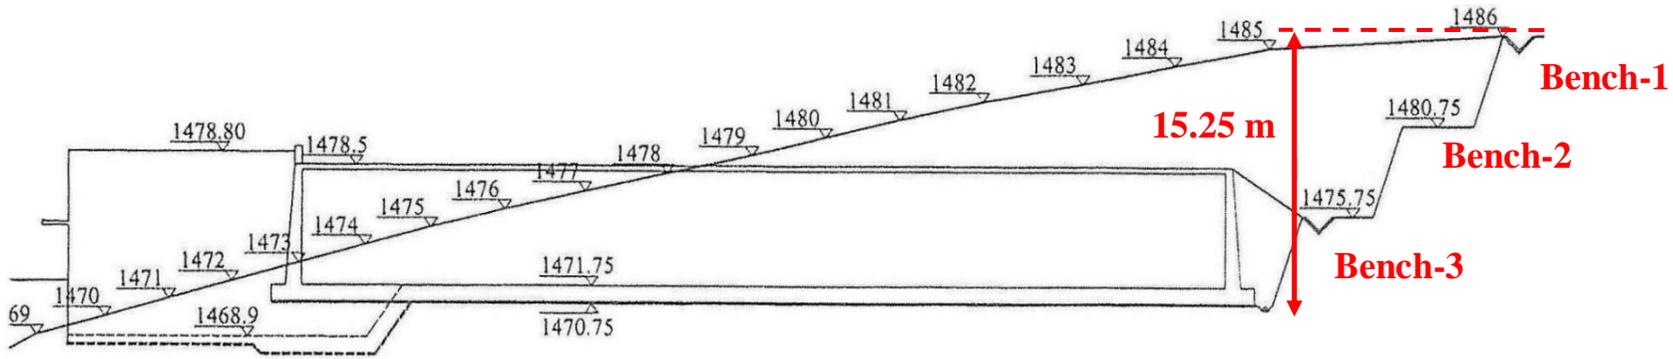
Yozgat main water tank construction plan and the gas pipeline
